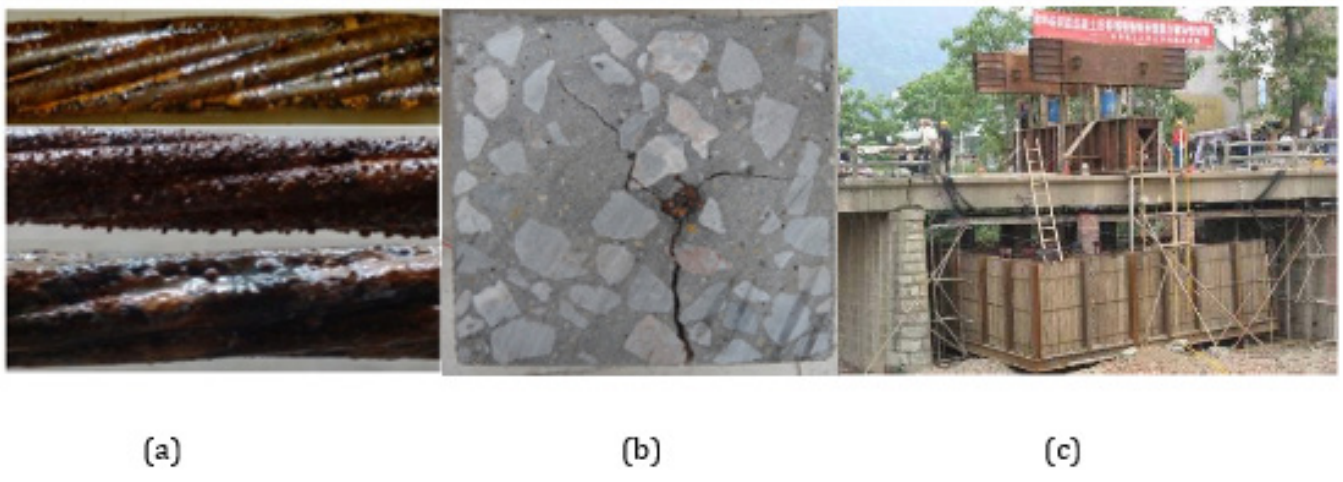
Bridge deterioration caused by strand corrosion: (a) Strand corrosion; (b) Corrosion-induced cracking; (c) Loading test.
